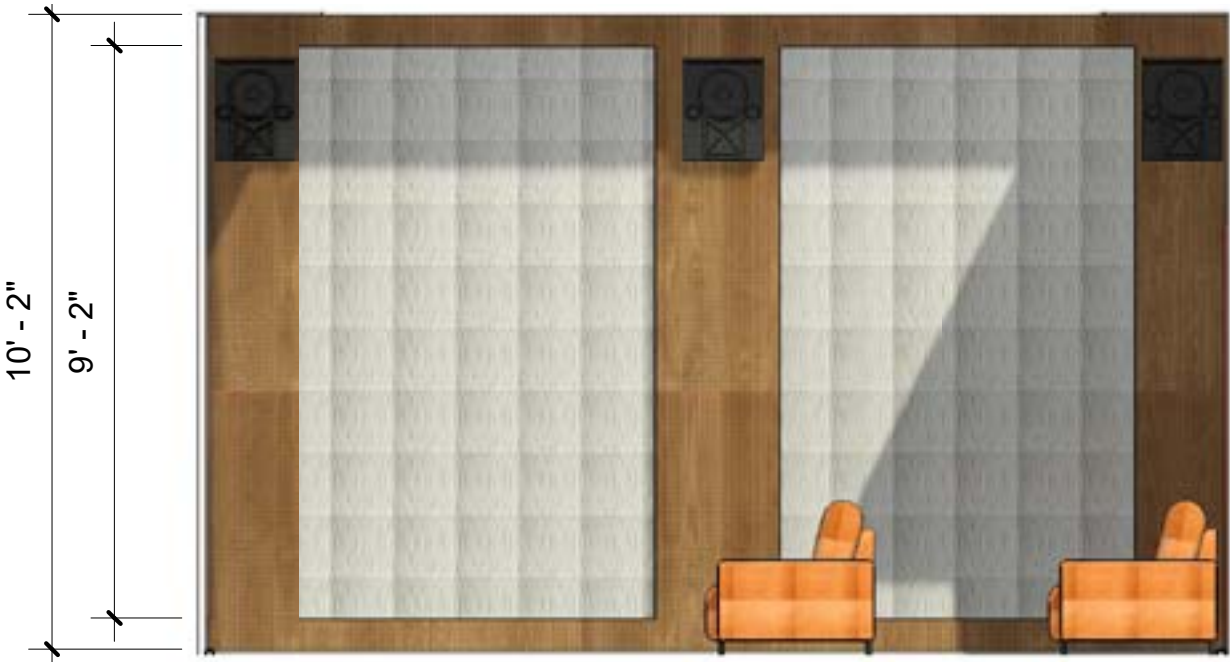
SECOND FLOOR - MOVIE ROOM ACOUSTICAL WALL ELEVATION NTS
